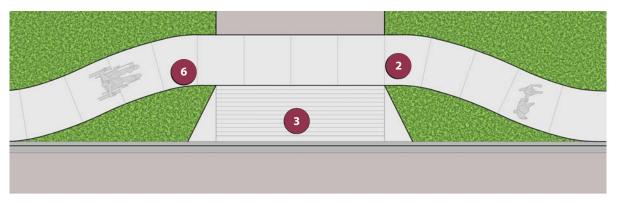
// DRIVEWAY CROSSING OF NON-SEPARATED SIDEWALK (WRAPPED AROUND DRIVEWAY)
